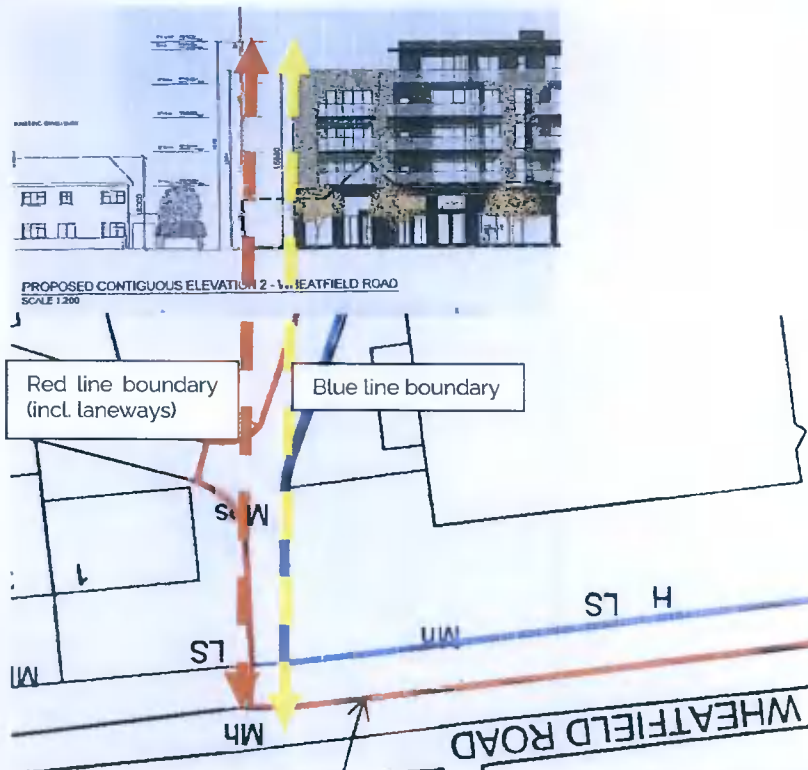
Applicant scheme drawings are misleading as to the site's actual blue line boundary
